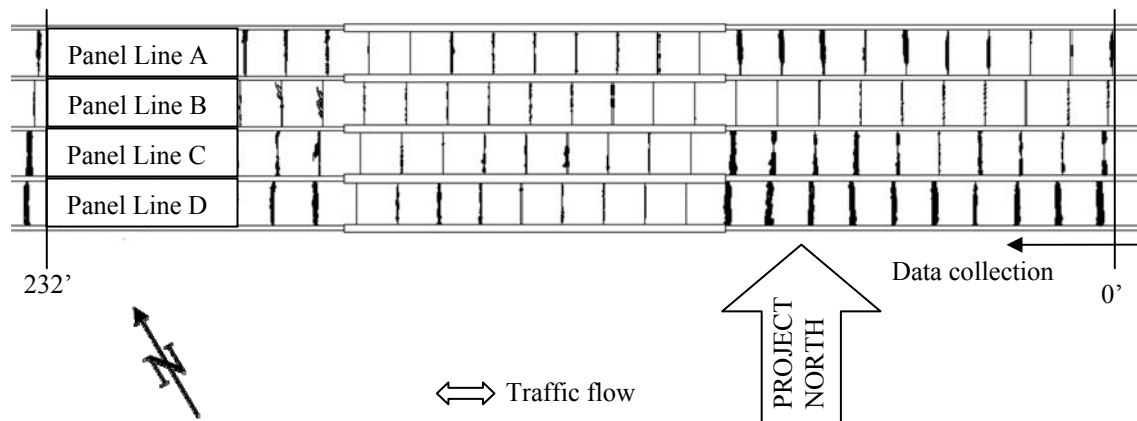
Labeling Rubric Used for Bridge A4709 Bridge Site Investigation
